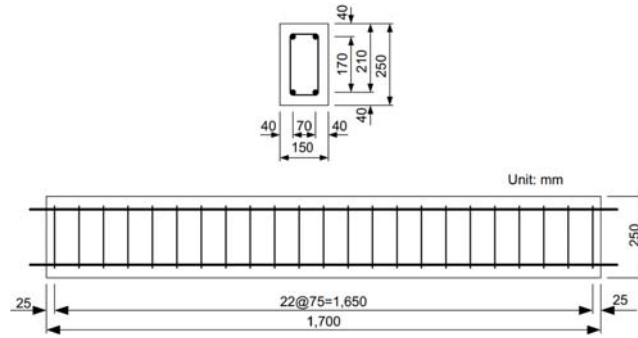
Beam geometry and reinforcement arrangement for Beam Case I (Fujikake, K. Li, B. Soeun, S. 2009).
